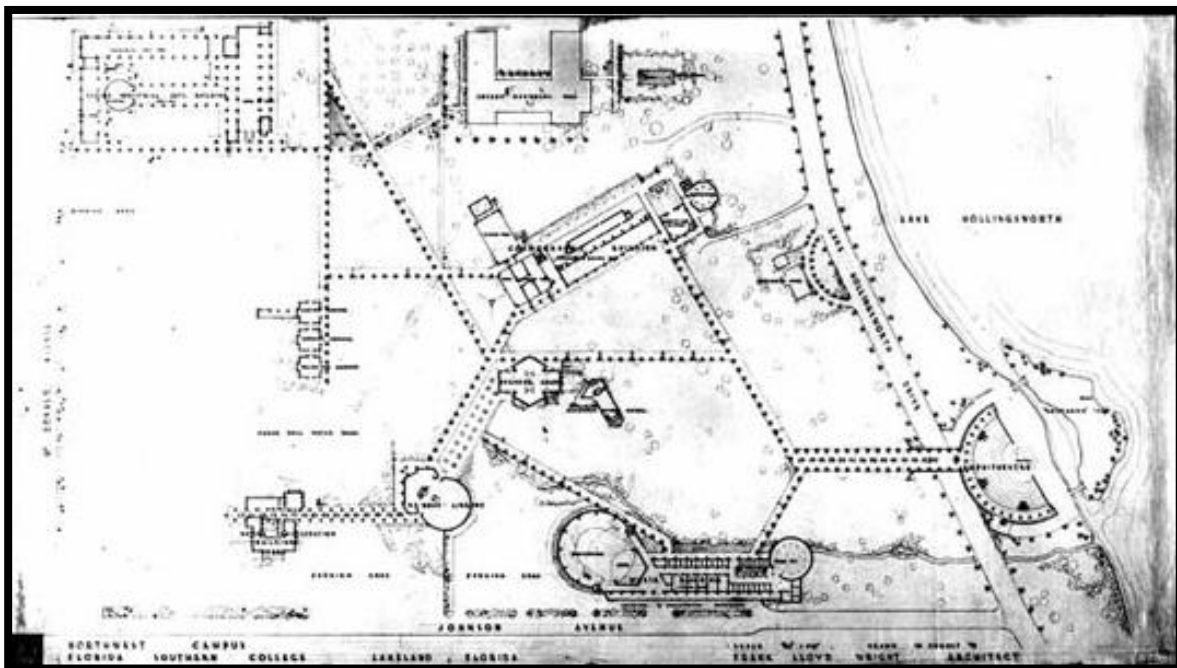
Final Master Plan of Florida Southern College. *The State of Florida Archives.
